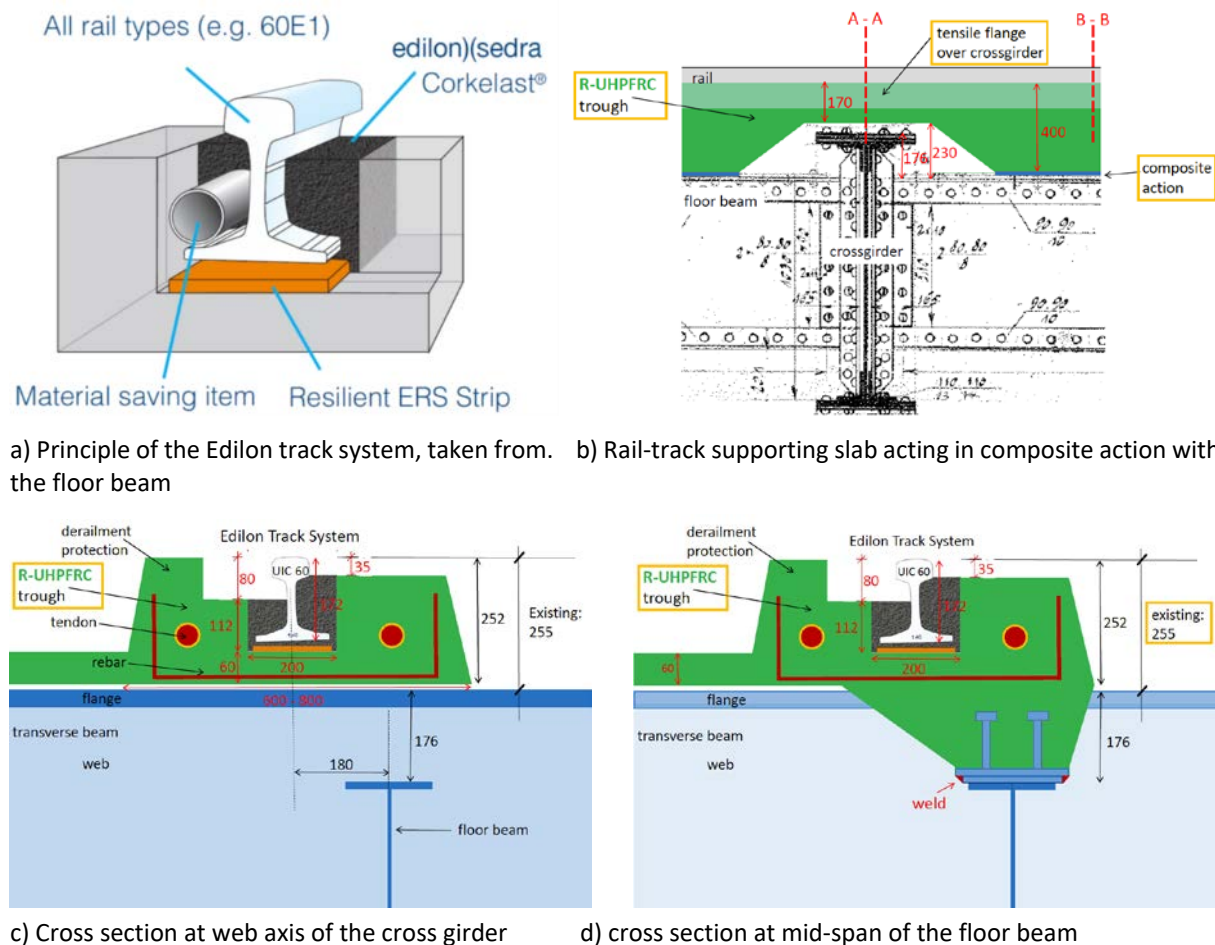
Edilon Track System and conceptual design of the trough in R-UHPFRC acting in composite action with the floor beam.
